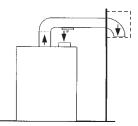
Single Pipe Horizontal Termination TABLE 5A-SINGLE PIPE HORIZONTAL AND VERTICAL VENTING
